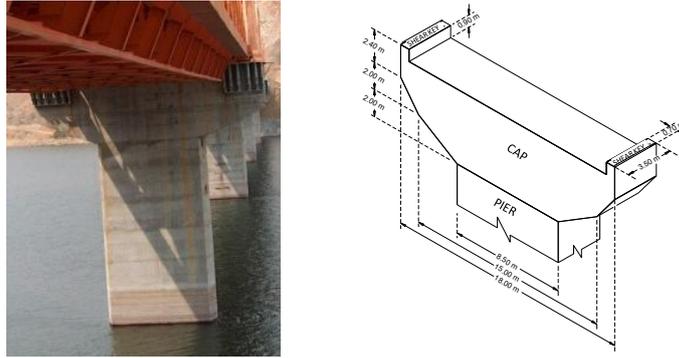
Reinforced Concrete Piers and Hammerhead cap of the Infiernillo II Bridge
